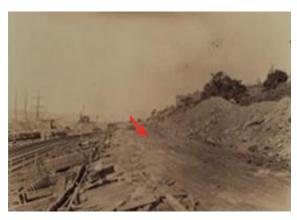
Graded strip (arrow) east of the tracks at 75th Street in 1931. The view is north (Sperr 1931)
